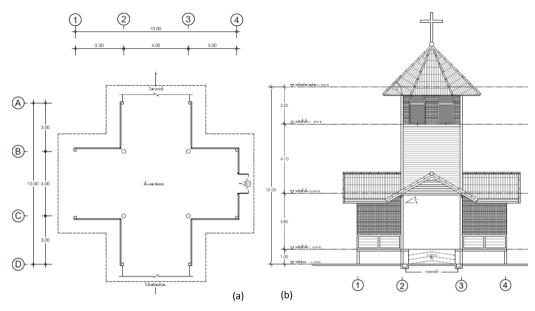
(a) Floor Plan; (b) Front Section of the Bell Tower
